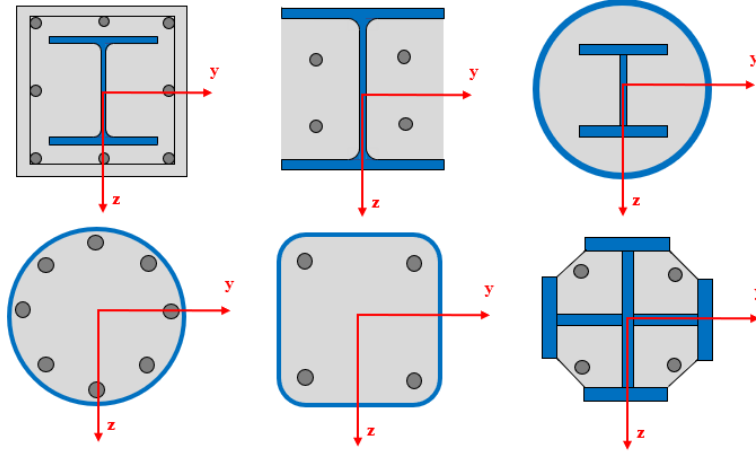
Double symmetric cross-section eligible for simplified methods
